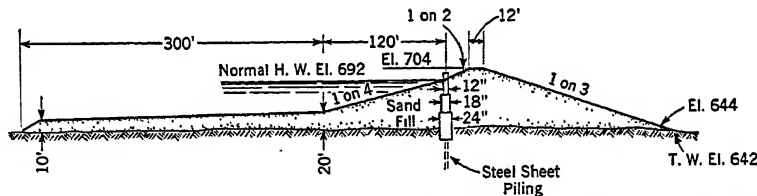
Junction Dam showing reinforced concrete core wall on steel sheet piling cutoff
